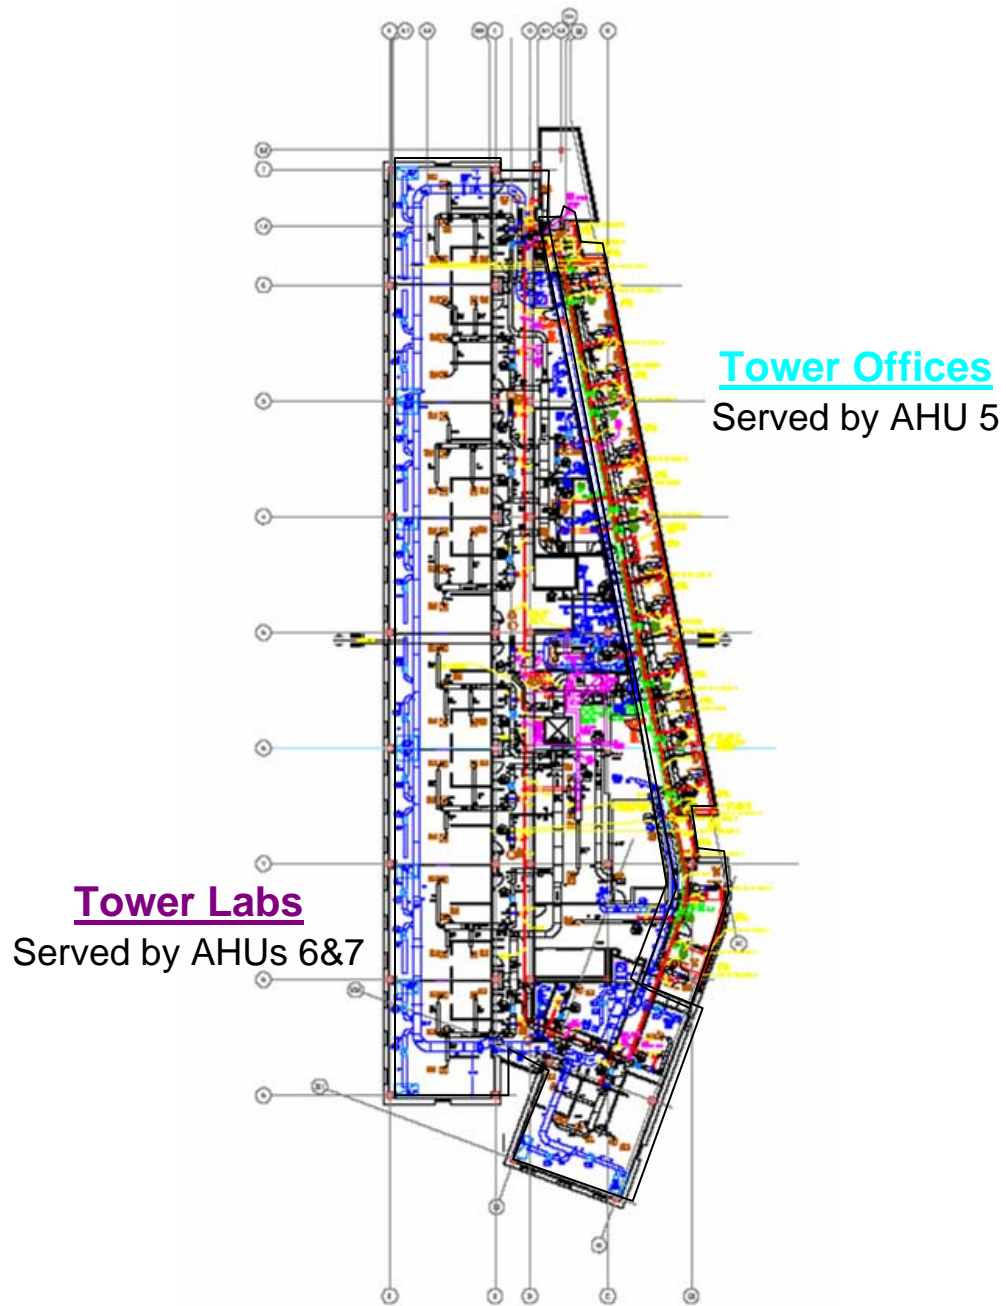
Rennebohm Hall, Floors 4 -7 Zones
